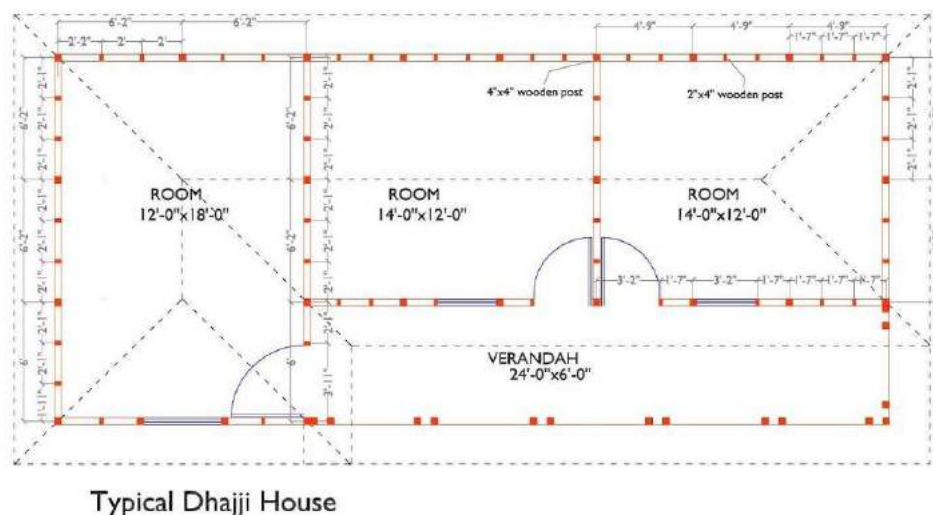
Typical plan view of an “engineered” dhajji dewari building after the 2005 Pakistan earthquake
